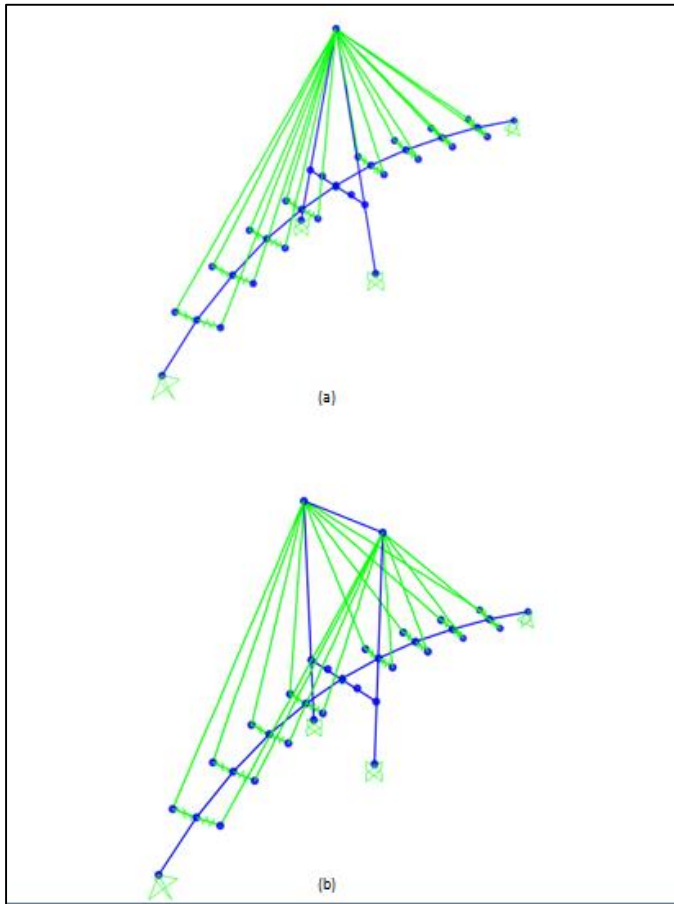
3D View of 60° deck curvature bridge modal with A & H shape pylon
